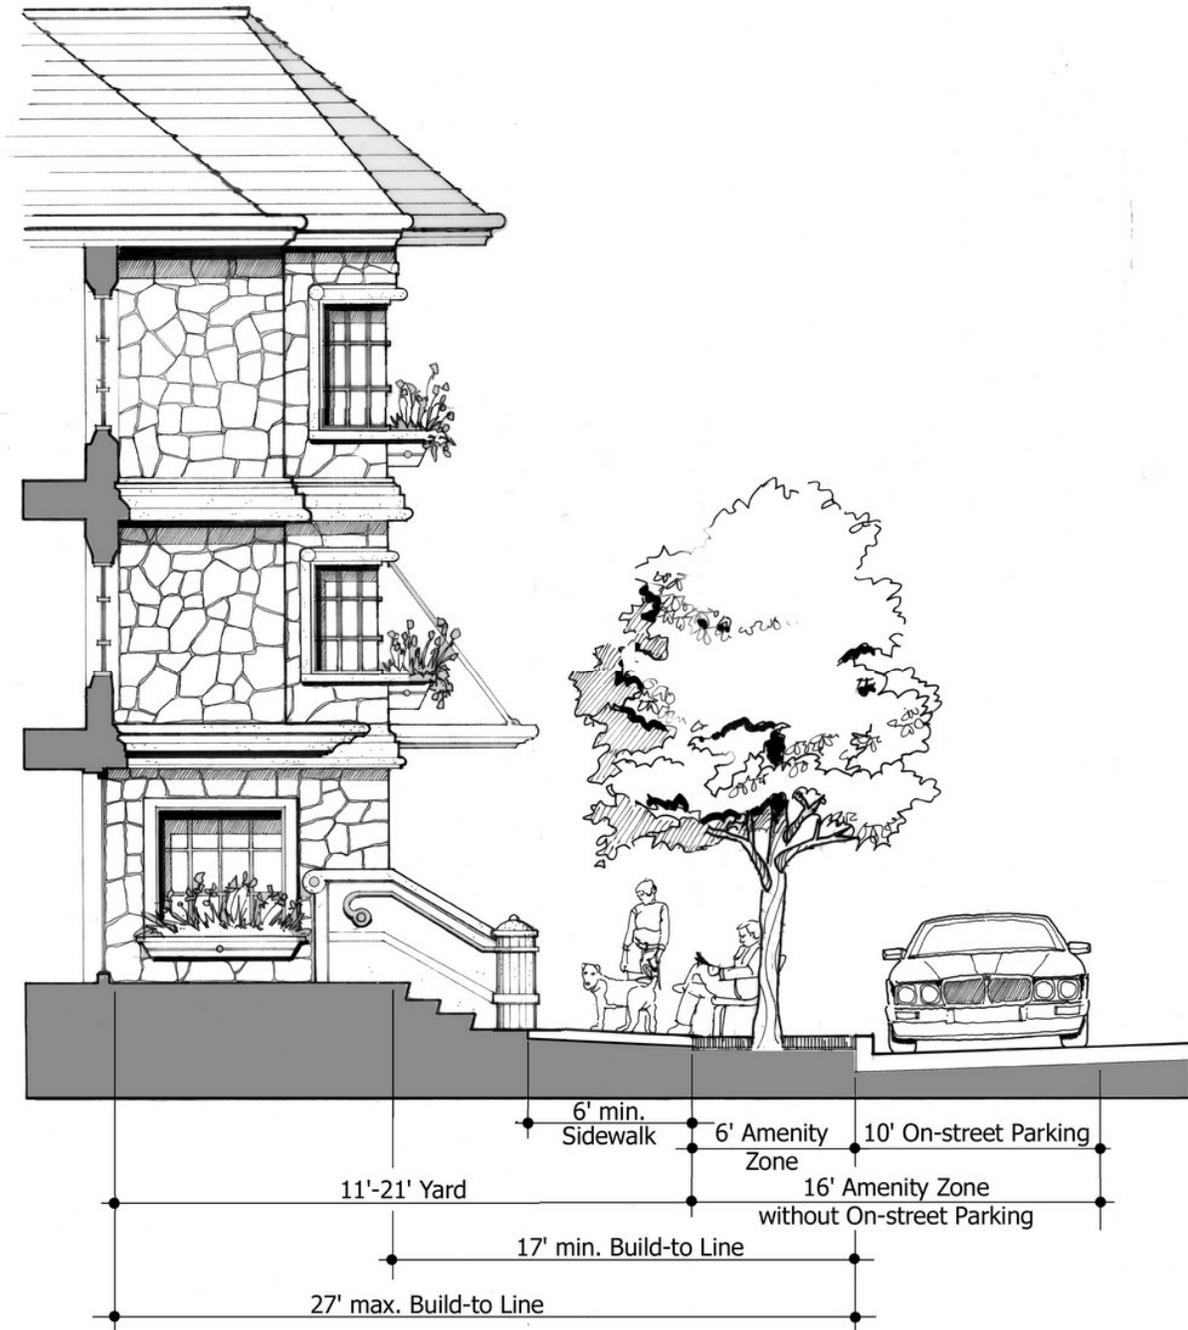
Street section, non-arterial streets (except Greenville Avenue)
